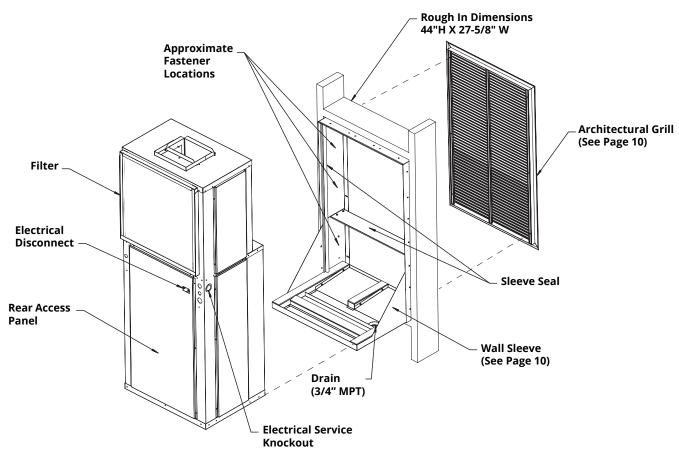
A - General Assembly for Large Sleeve and Grill size 24
